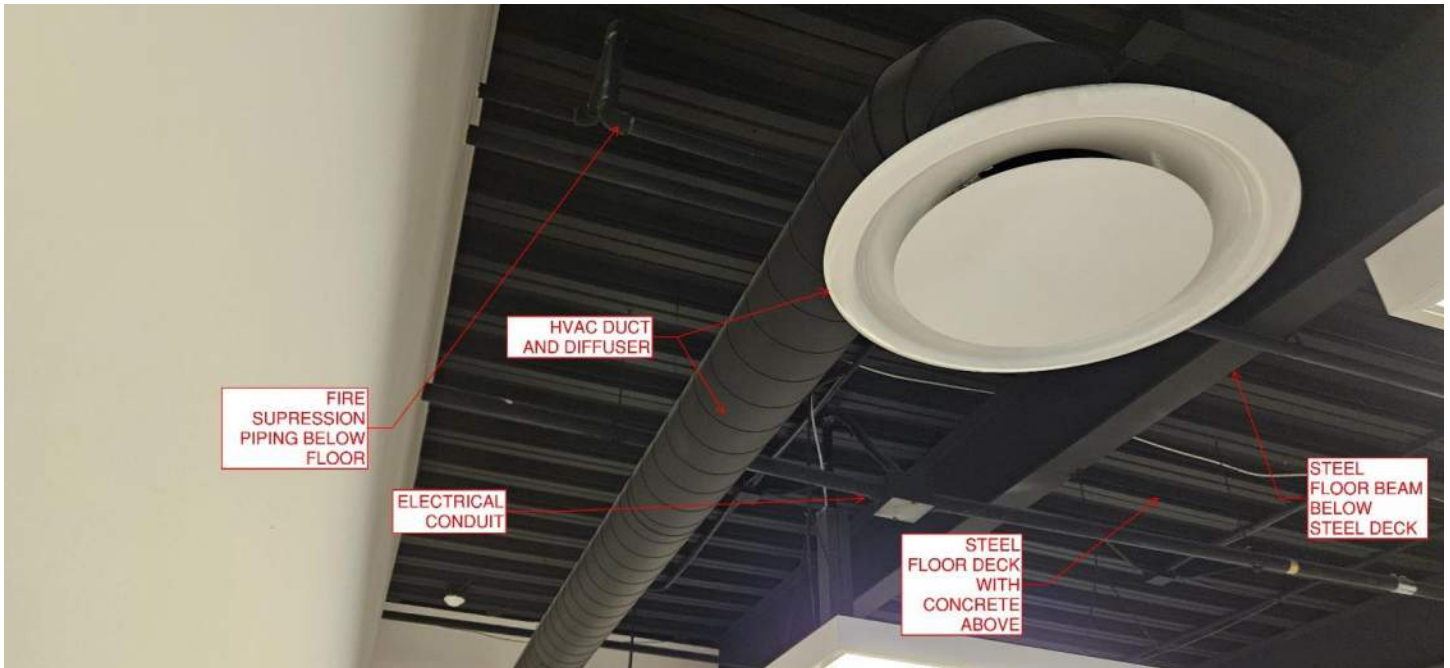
CEILING SPACE ABOVE THE MAIN LEVEL
